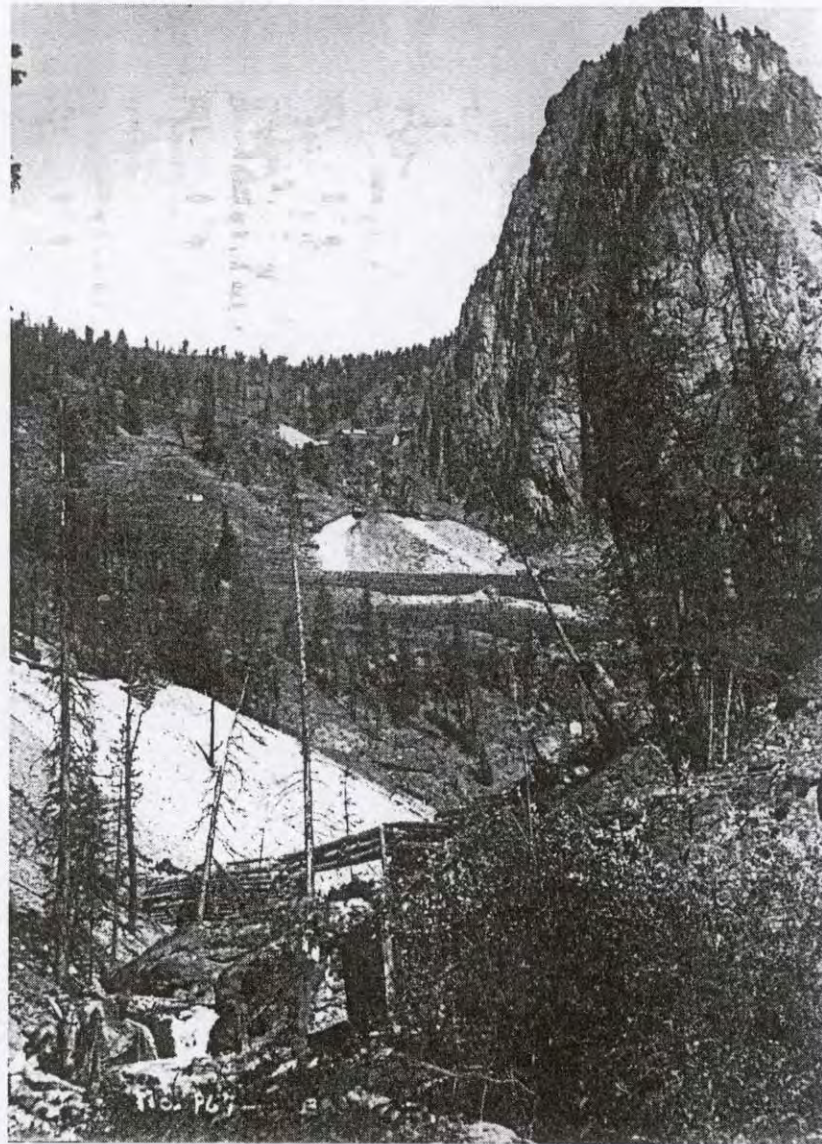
The Bachelor Mining Company developed its property through two principal tunnels. The lower tunnel, defined by the waste rock and log cribbing walls near photo-center, served as a haulageway. The upper tunnel is denoted by a small waste rock dump above. The waste rock dump at lower left belongs to either the Nelson Tunnel, or the Commodore Tunnel No.5. The photo was taken in the late 1890s, and many of the structures at the Bachelor dating to this era remain. Courtesy of Colorado Historical Society (S0025670).
